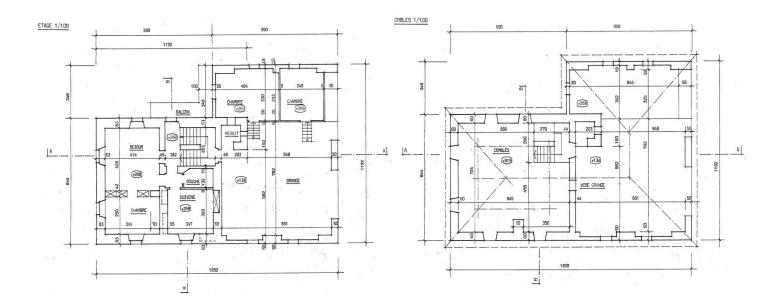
Appendix – Architectural plans of 1st Floor (left) and 2nd Floor (right)
